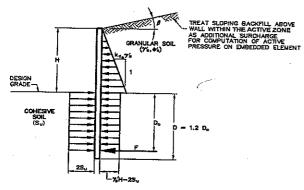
Unfactored Simplified Earth Pressure Distributions for Temporary Nongravity Cantilevered Walls with Discrete Vertical Wall Elements Embedded in Cohesive Soil and Retaining Granular Soil.
